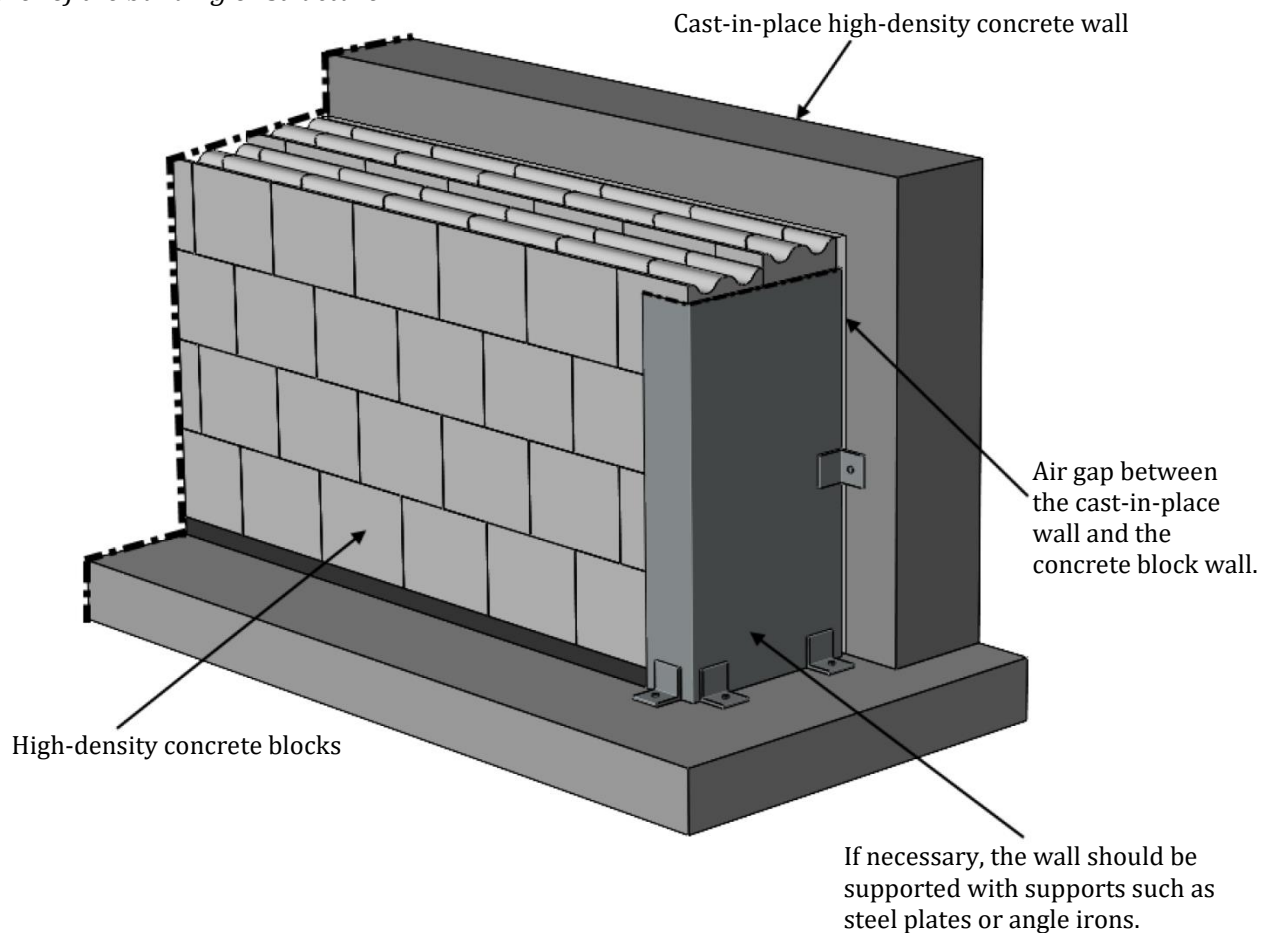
Additional protective wall made of high-density concrete blocks. Always follow the instructions provided by the designer of the building or structure!
